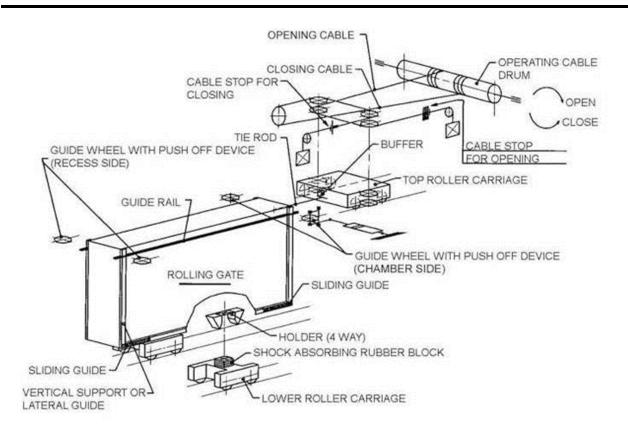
Wire rope drive machinery layout (from Design of Locks – Netherlands, Rijkswaterstaat)
